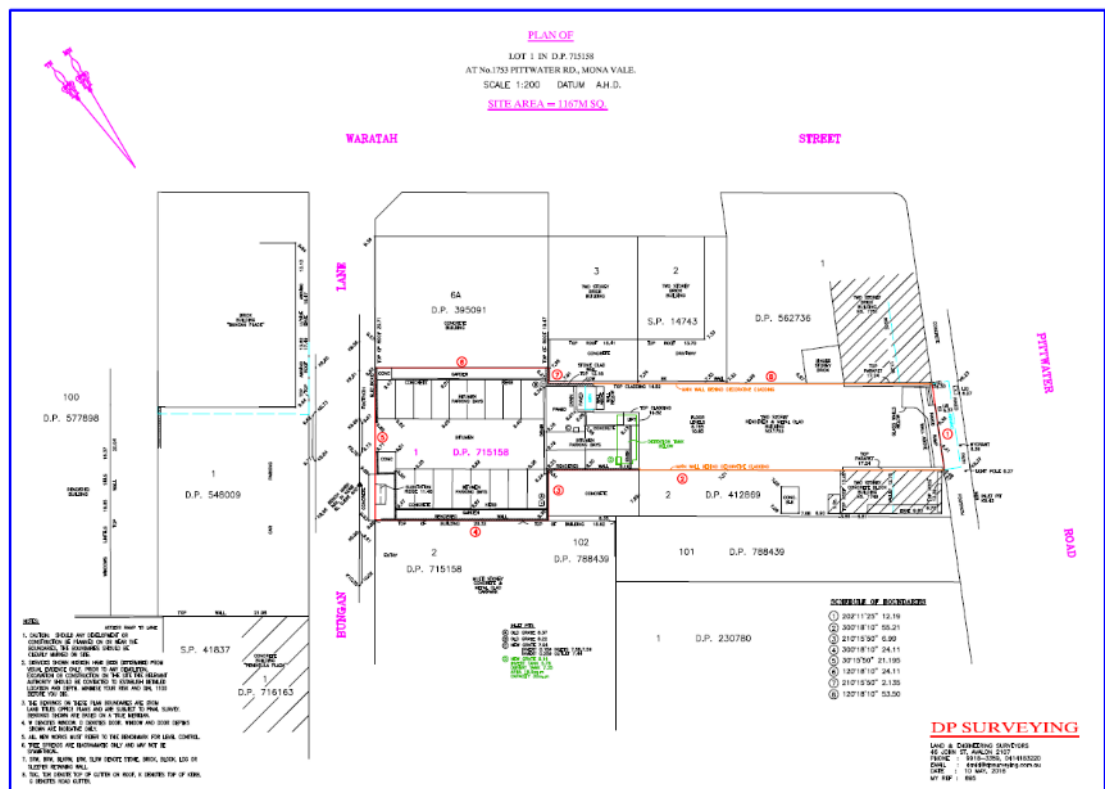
Site survey – 1753 Pittwater Road, Mona Vale
